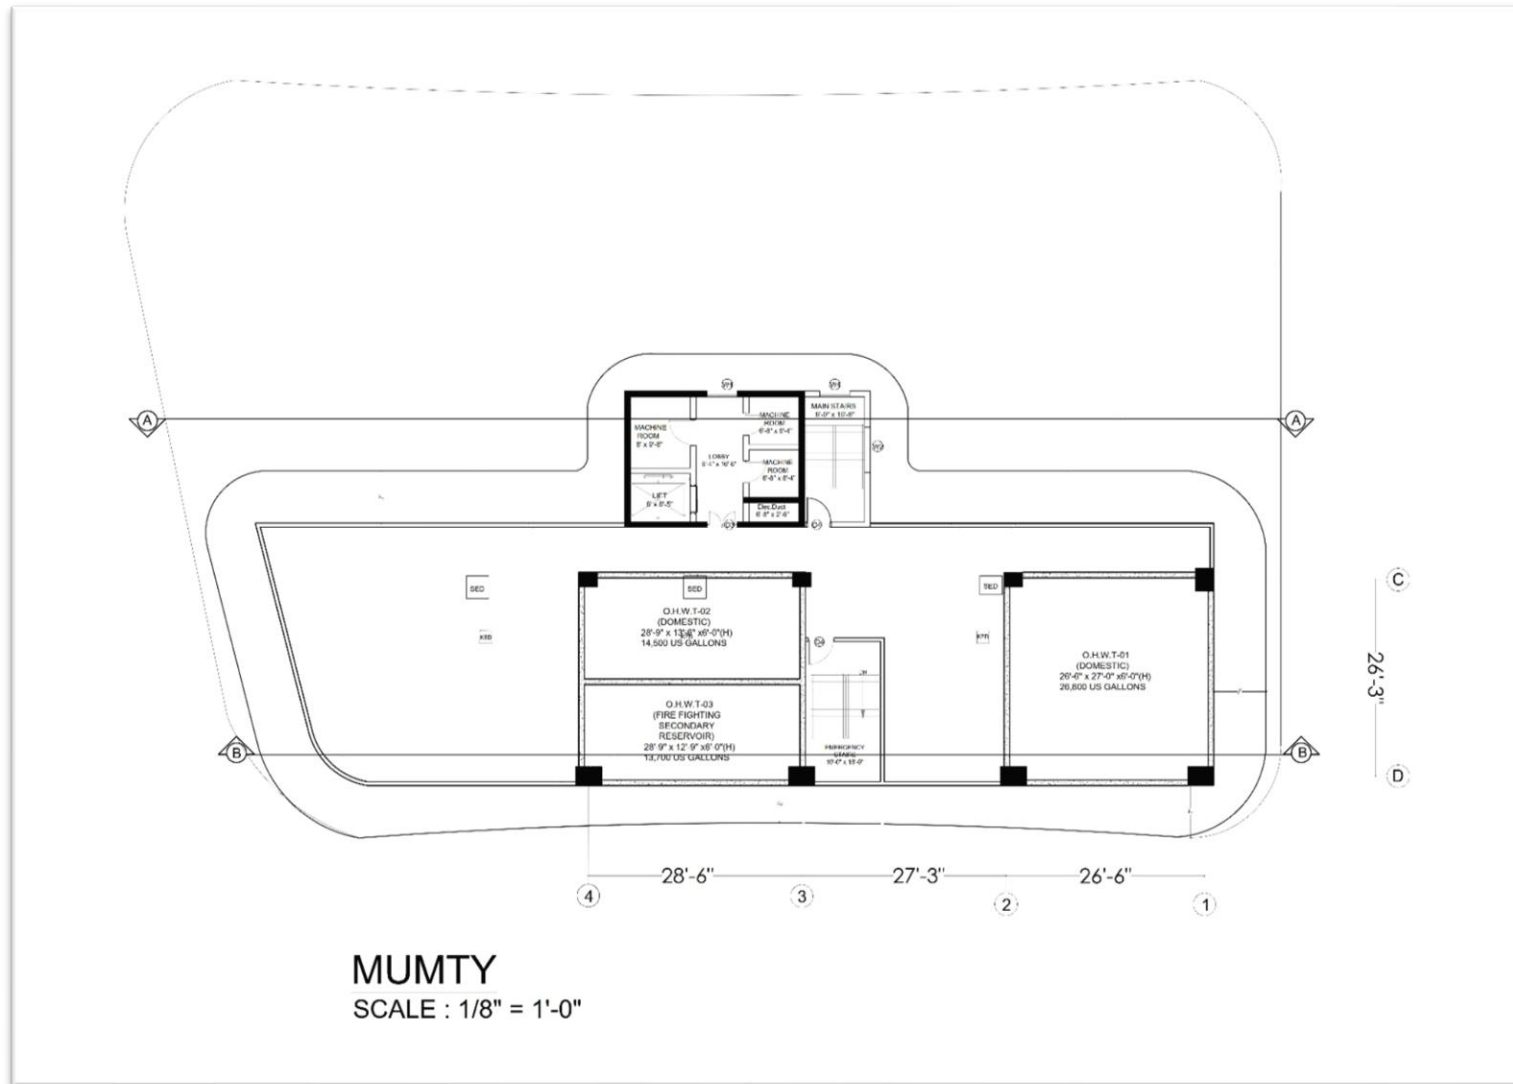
Top Floor Plan of One Hills Apartments Tower III Project
